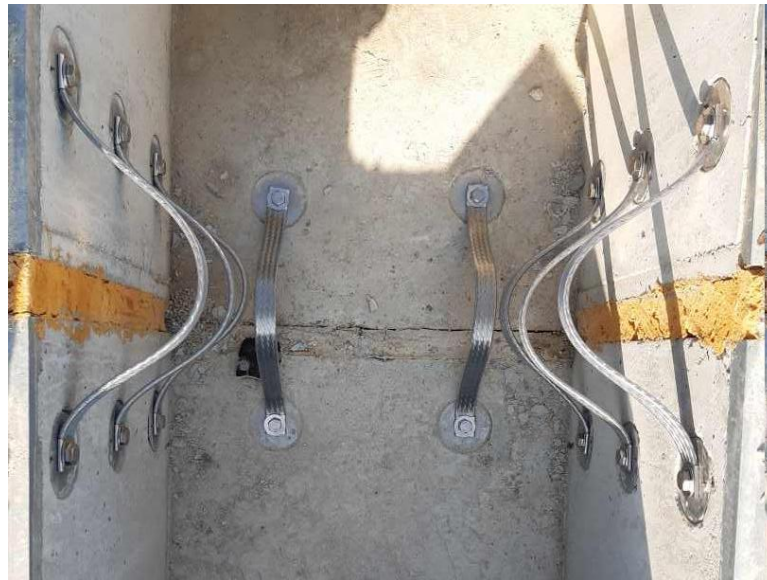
Interconnection of two sections of the reinforced concrete duct.
